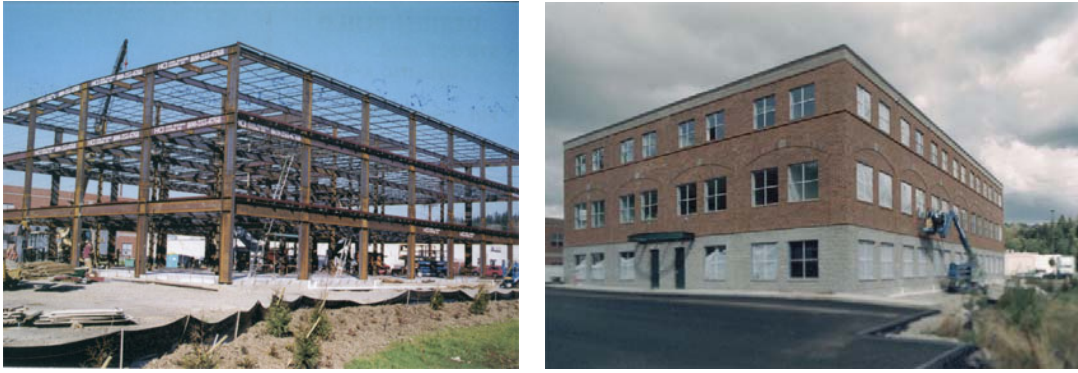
A three-storey Pre-Engineered Building under construction by assembling of pre-engineered components, and in finished state. (Source: *www.hcisteel.com*, 2004)
